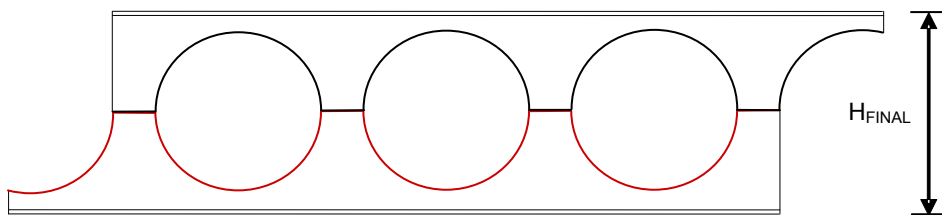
Welding of the two parts of the parent profile
